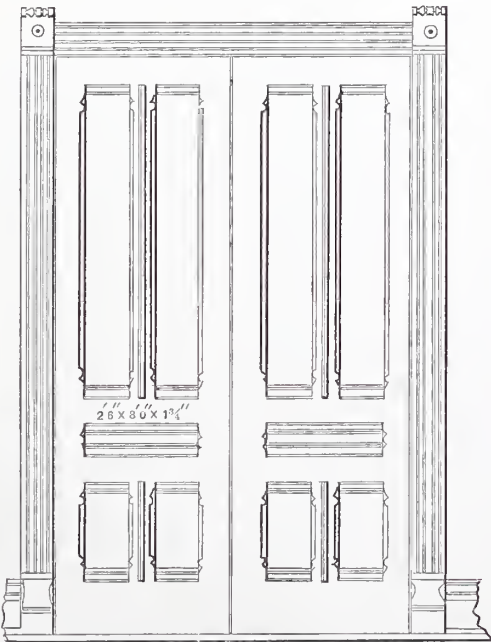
Elevation of Sliding Doors.—Scale, 3/8
